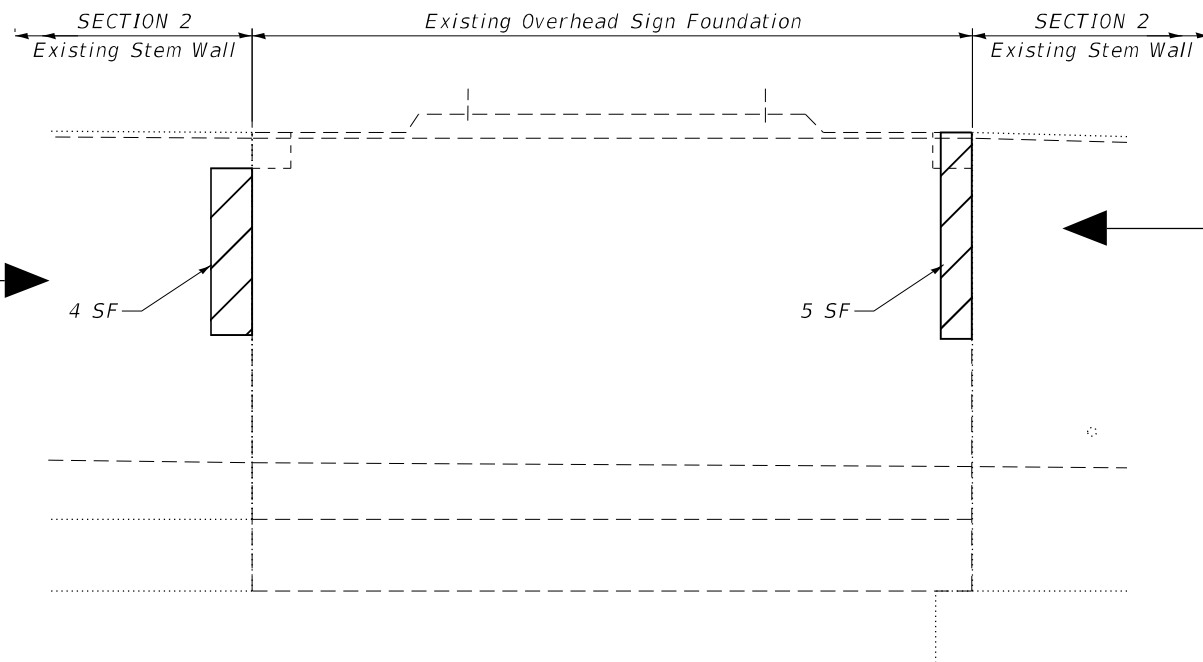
Section 2 - Overhead Sign Structure Foundation with Spall
